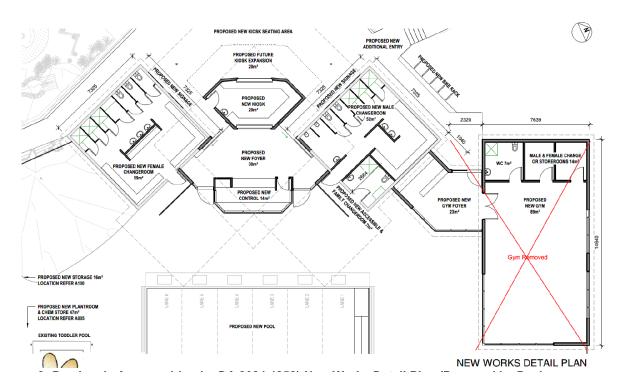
Existing approval showing initial design of kiosk and control room, and the location of the deleted gym.
